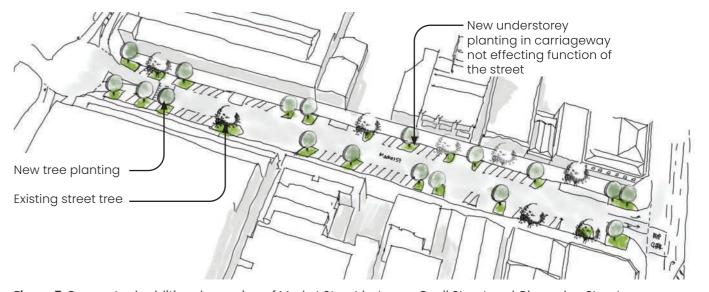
Conceptual additional greening of Market Street between Cecil Street and Clarendon Street
